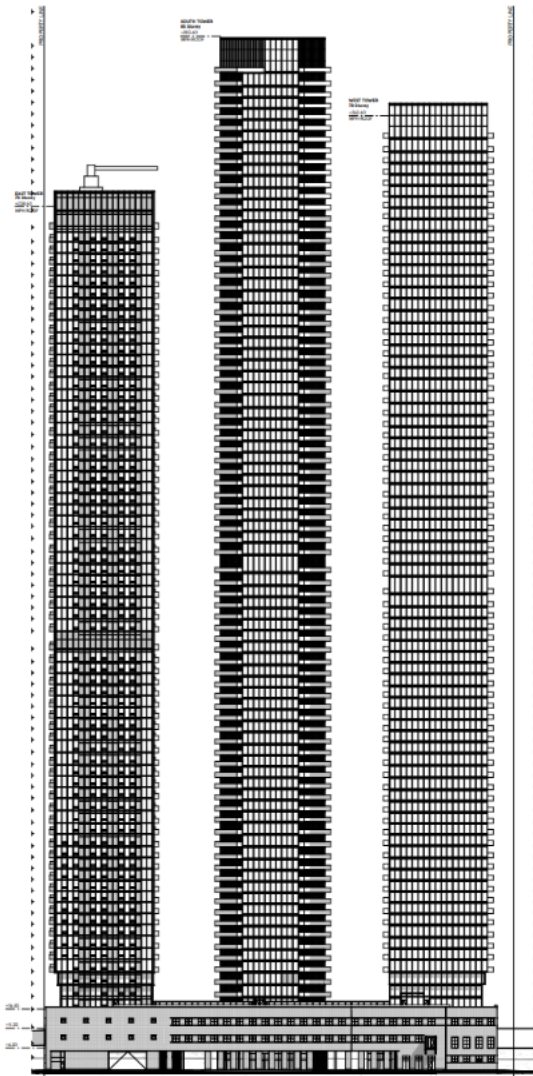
North elevation drawing of the Warehouse Building included for illustration purposes (architectsAlliance, February 14, 2026).
